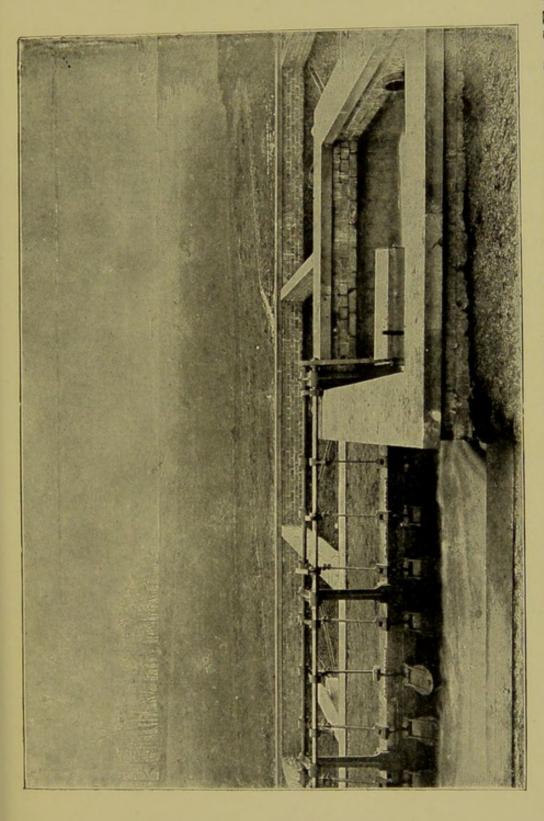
PLATE III. - MATHER & PLATTS' AUTOMATIC ALTERNATING GEAR FOR CONTACT BEDS AND CONTINUOUS FILTERS.
